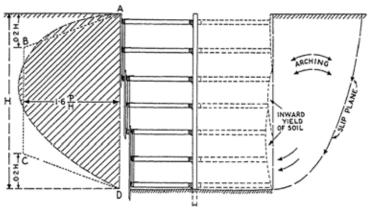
Timbering of Excavations. Distribution of Earth Pressure.
